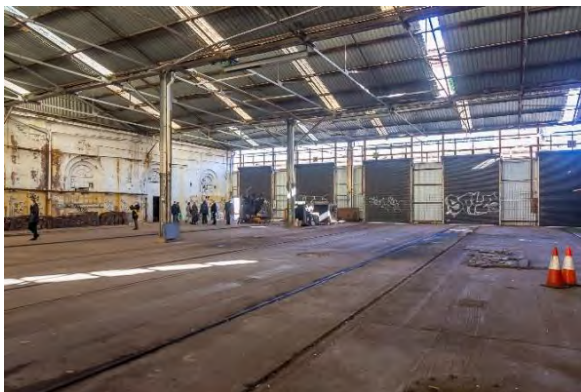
Western view of the former Suburban Car Workshops connecting to the Paint Shop's north internal wall (Source: Curio 2021)
